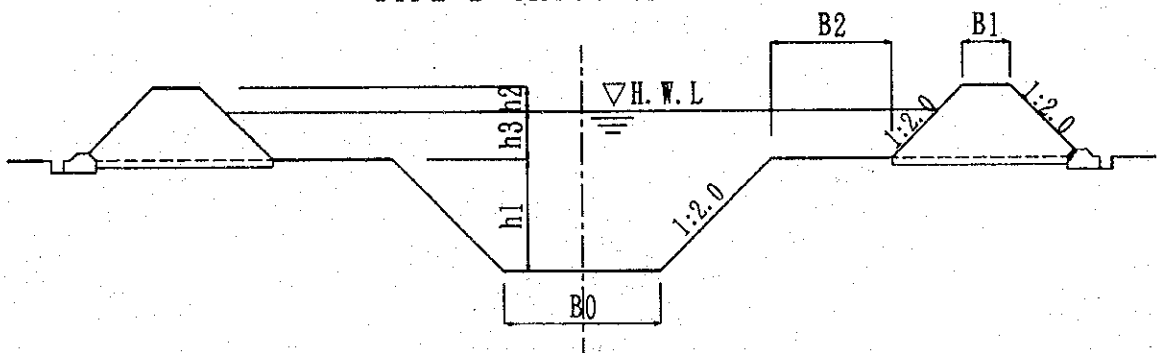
PROPOSED CROSS SECTIONS FOR
